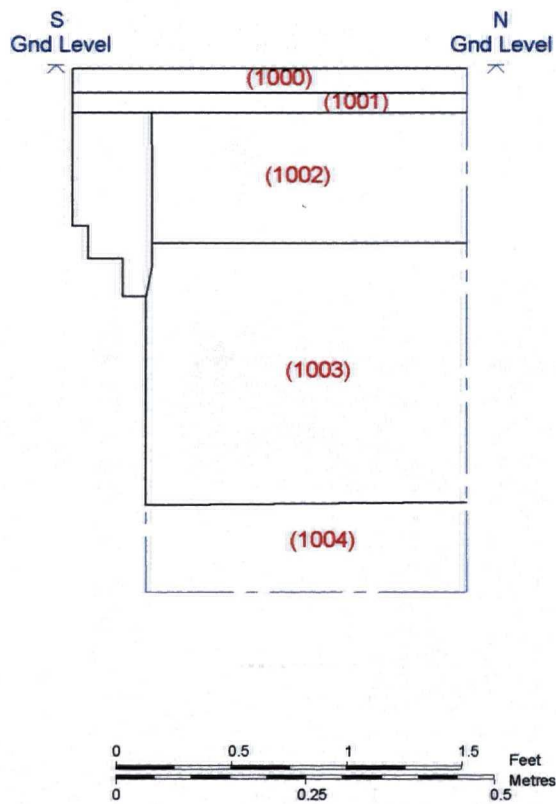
East facing section of western foundation trench. (Scale 1:10).
